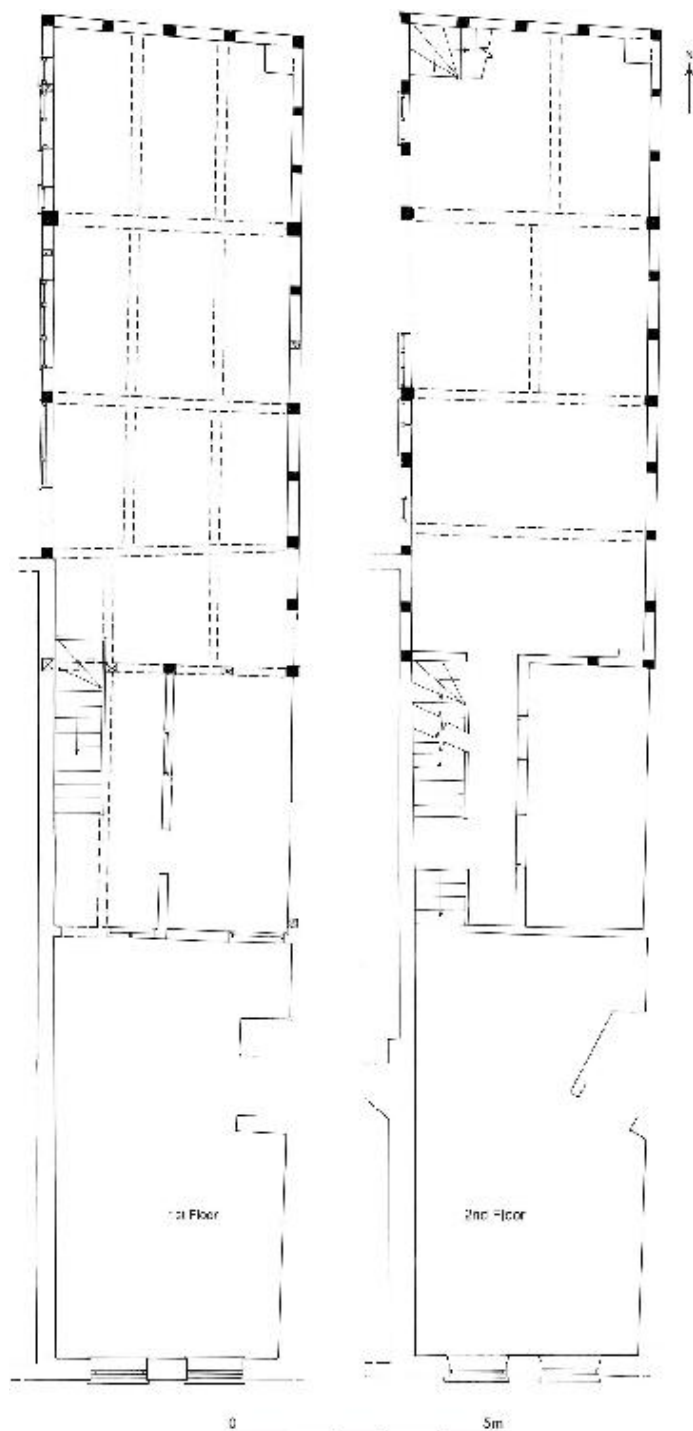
First- and second-floor plans of 10-11 High Town, with the timber-framed rear wing to the top
